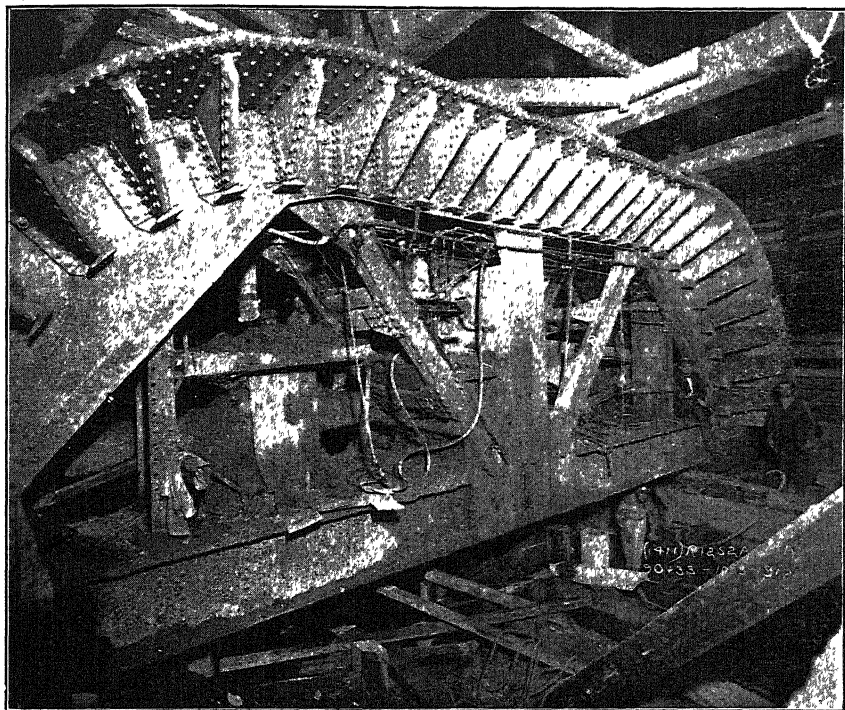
CUTTING EDGE OF ROOF SHIELD JUST AFTER BREAKING INTO SHAFT.
